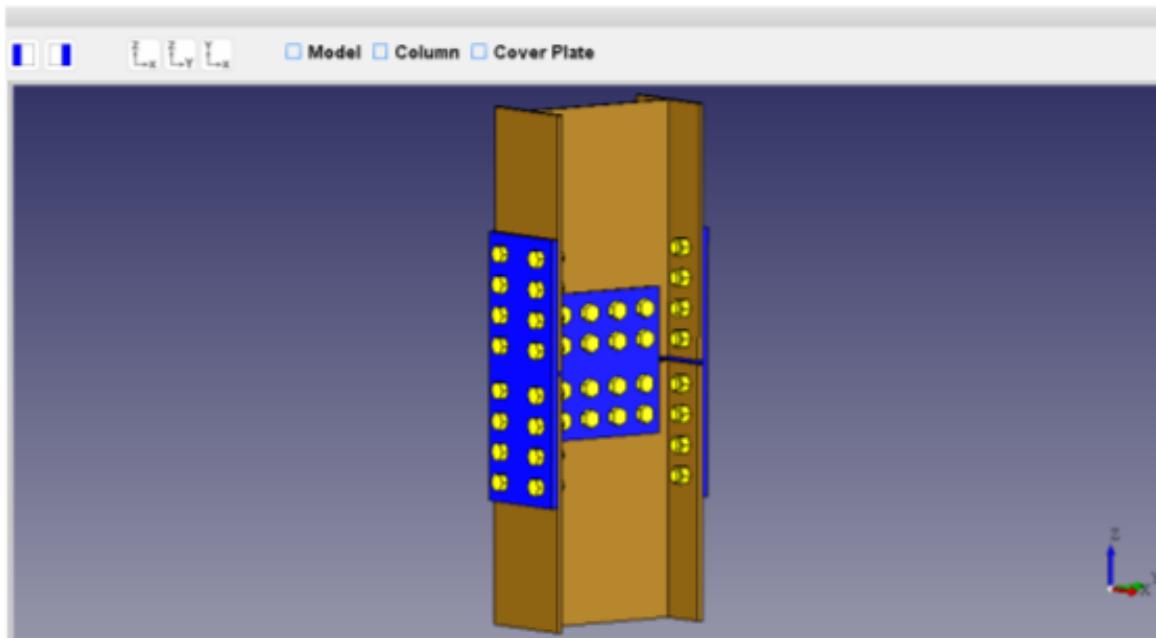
3D drawing output of typical Column-Column Cover Plate Bolted connection
